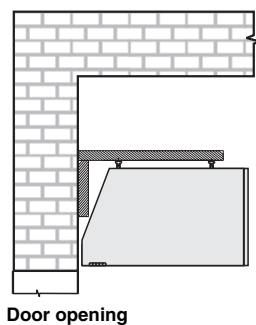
Hanging of air curtain by aid of threaded bars and the ceiling holders type VCS3-SD
